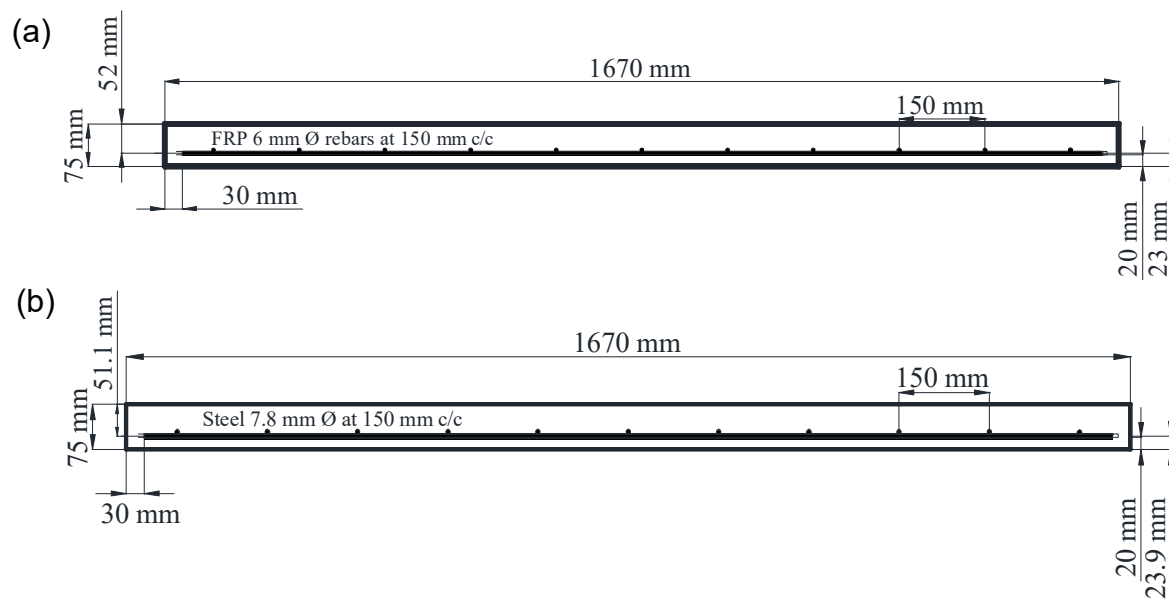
Cross-section (A–A) of (a) FRP reinforced slab and (b) steel reinforced slab.
